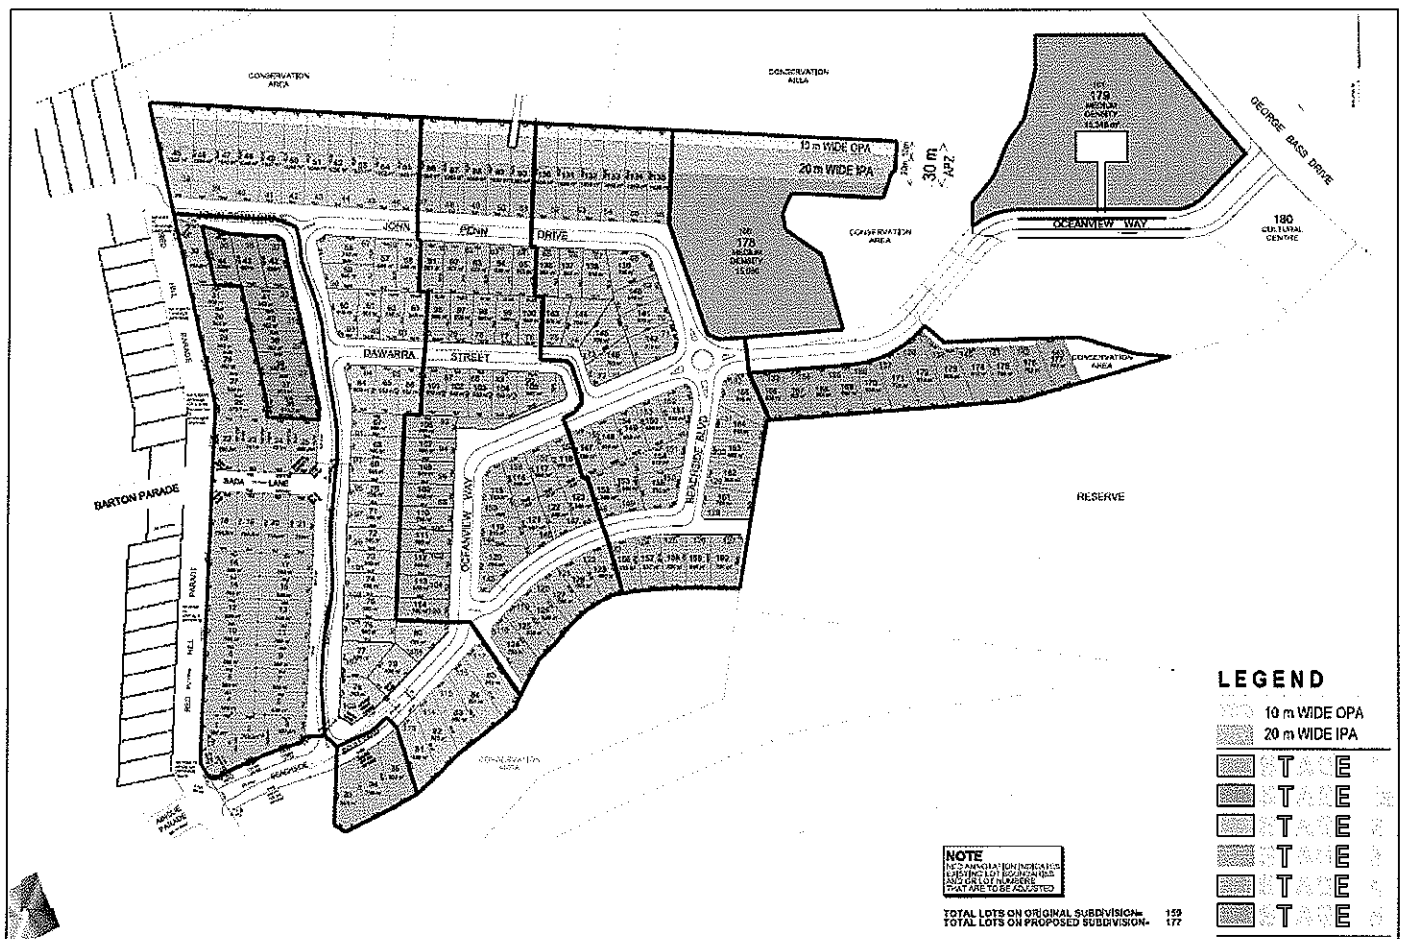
Amended Plan of Subdivision (as lodged on 9 April 2010)
